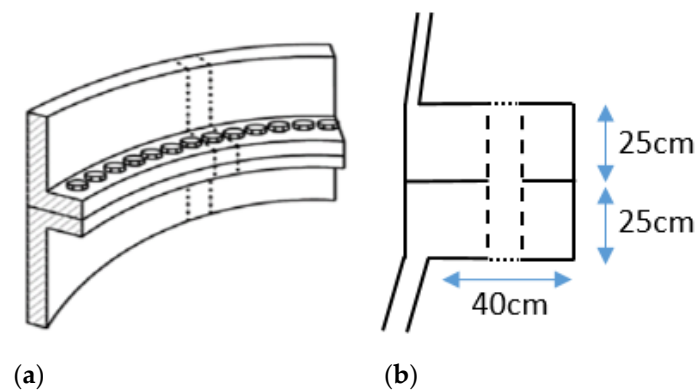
Flange bolted connection: (a) Bolted connection, (b) Geometric features.
